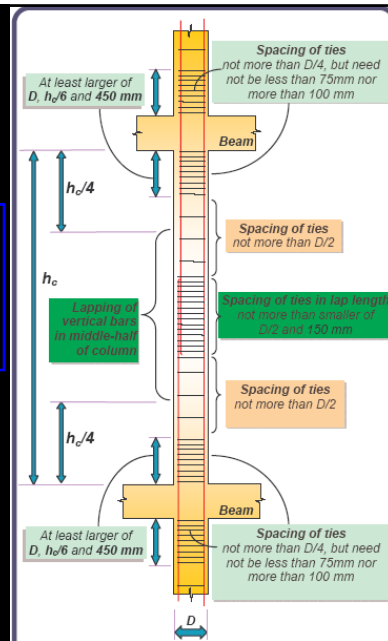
Placing vertical bars and closed ties in columns – column ends and lap lengths are to be protected with closely spaced ties.
